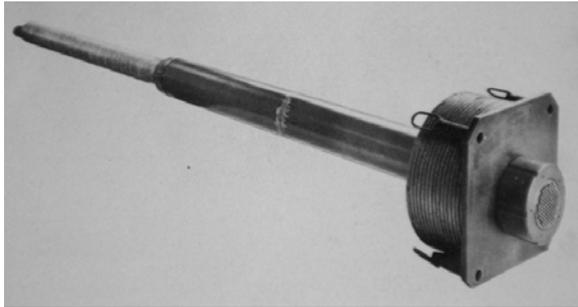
BBRV prestressing system with button head anchorage. (Wittfoht)
